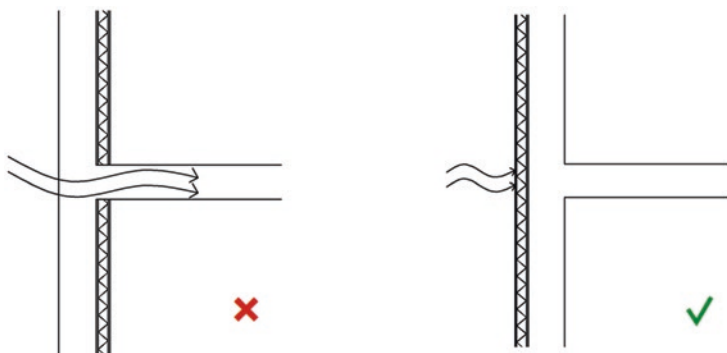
Correction of thermal bridges with ETICS. Internal insulation – thermal bridge (left). External insulation – correction of thermal bridge (right)
